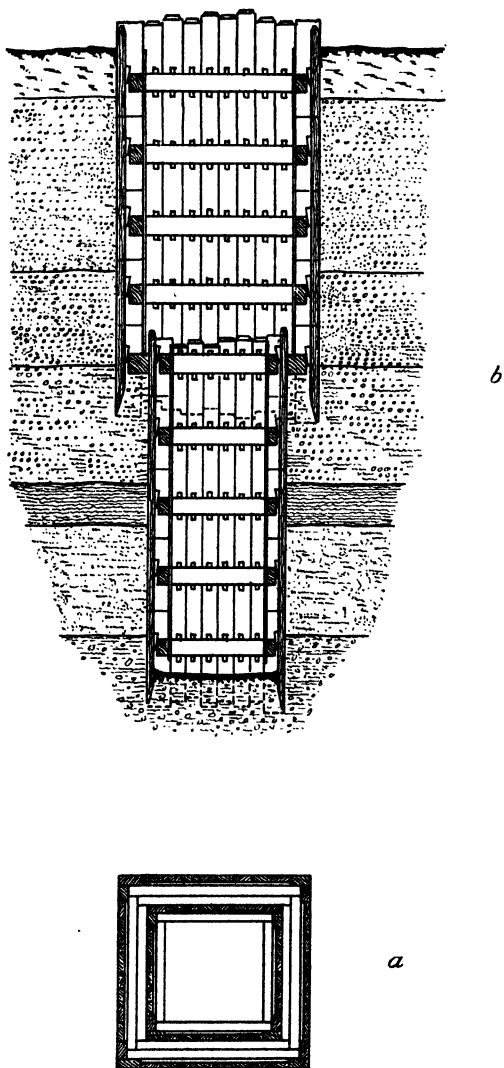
Test Pit with Double-Setting of Runners. (a) Plan; (b) Section.
